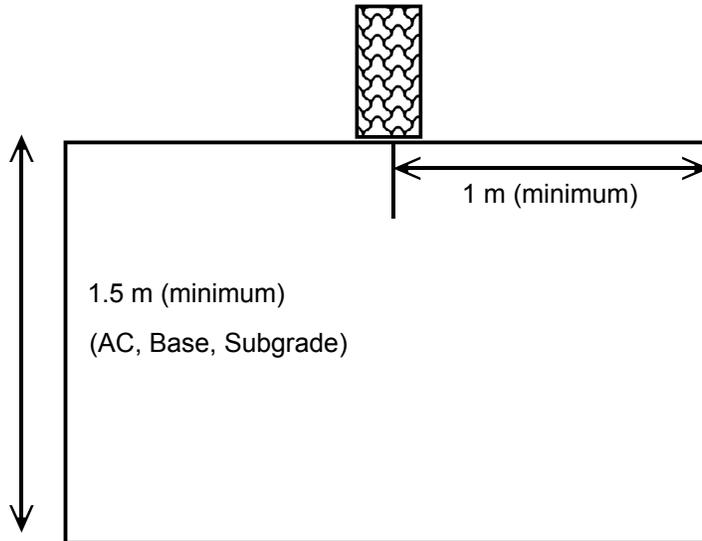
Minimum dimensions for a test-track pavement test facility.
